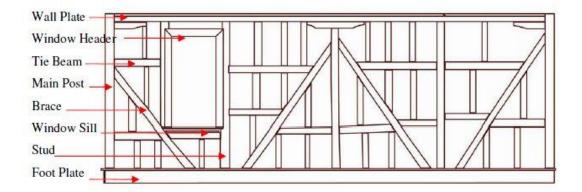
Detail of timber framed construction on Hisar Evi ,in Taraklı (Özyer, 2008, pp 87)
